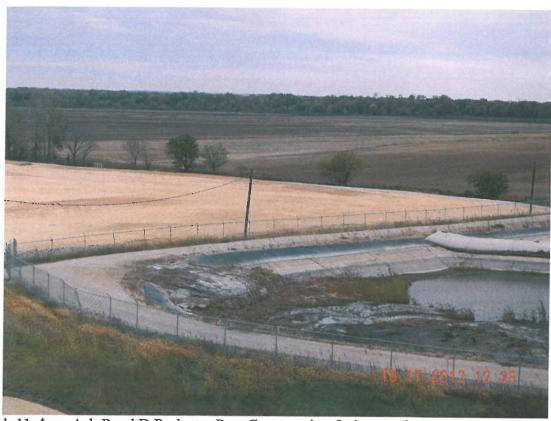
A - Ash Pond D Project - Post Construction facing west
